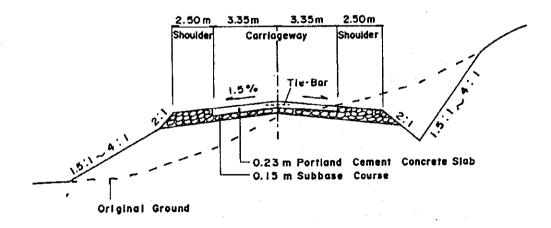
TYPICAL CROSS SECTION OF THE PAN-PHILIPPINE HIGHWAY
